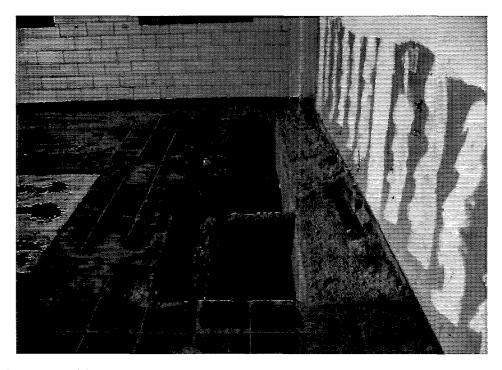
Building 84A UL#01 concrete removal area, looking east (spray paint indicates verification sample locations)
